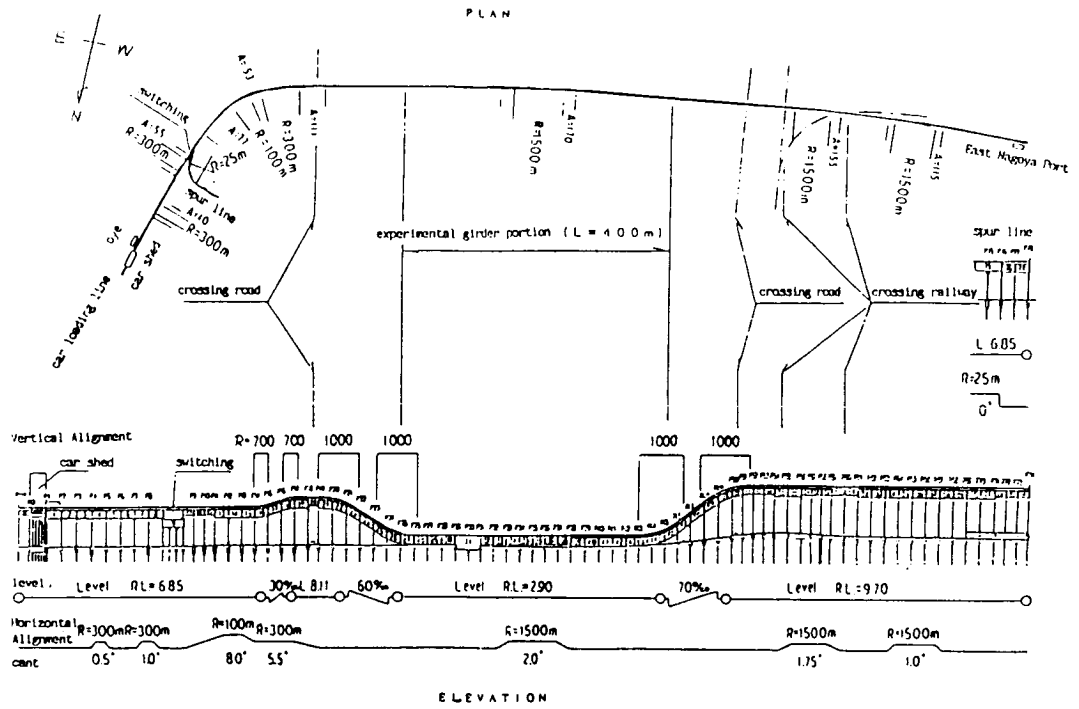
Horizontal Plan and Vertical Elevation of Test Track in Nagoya
